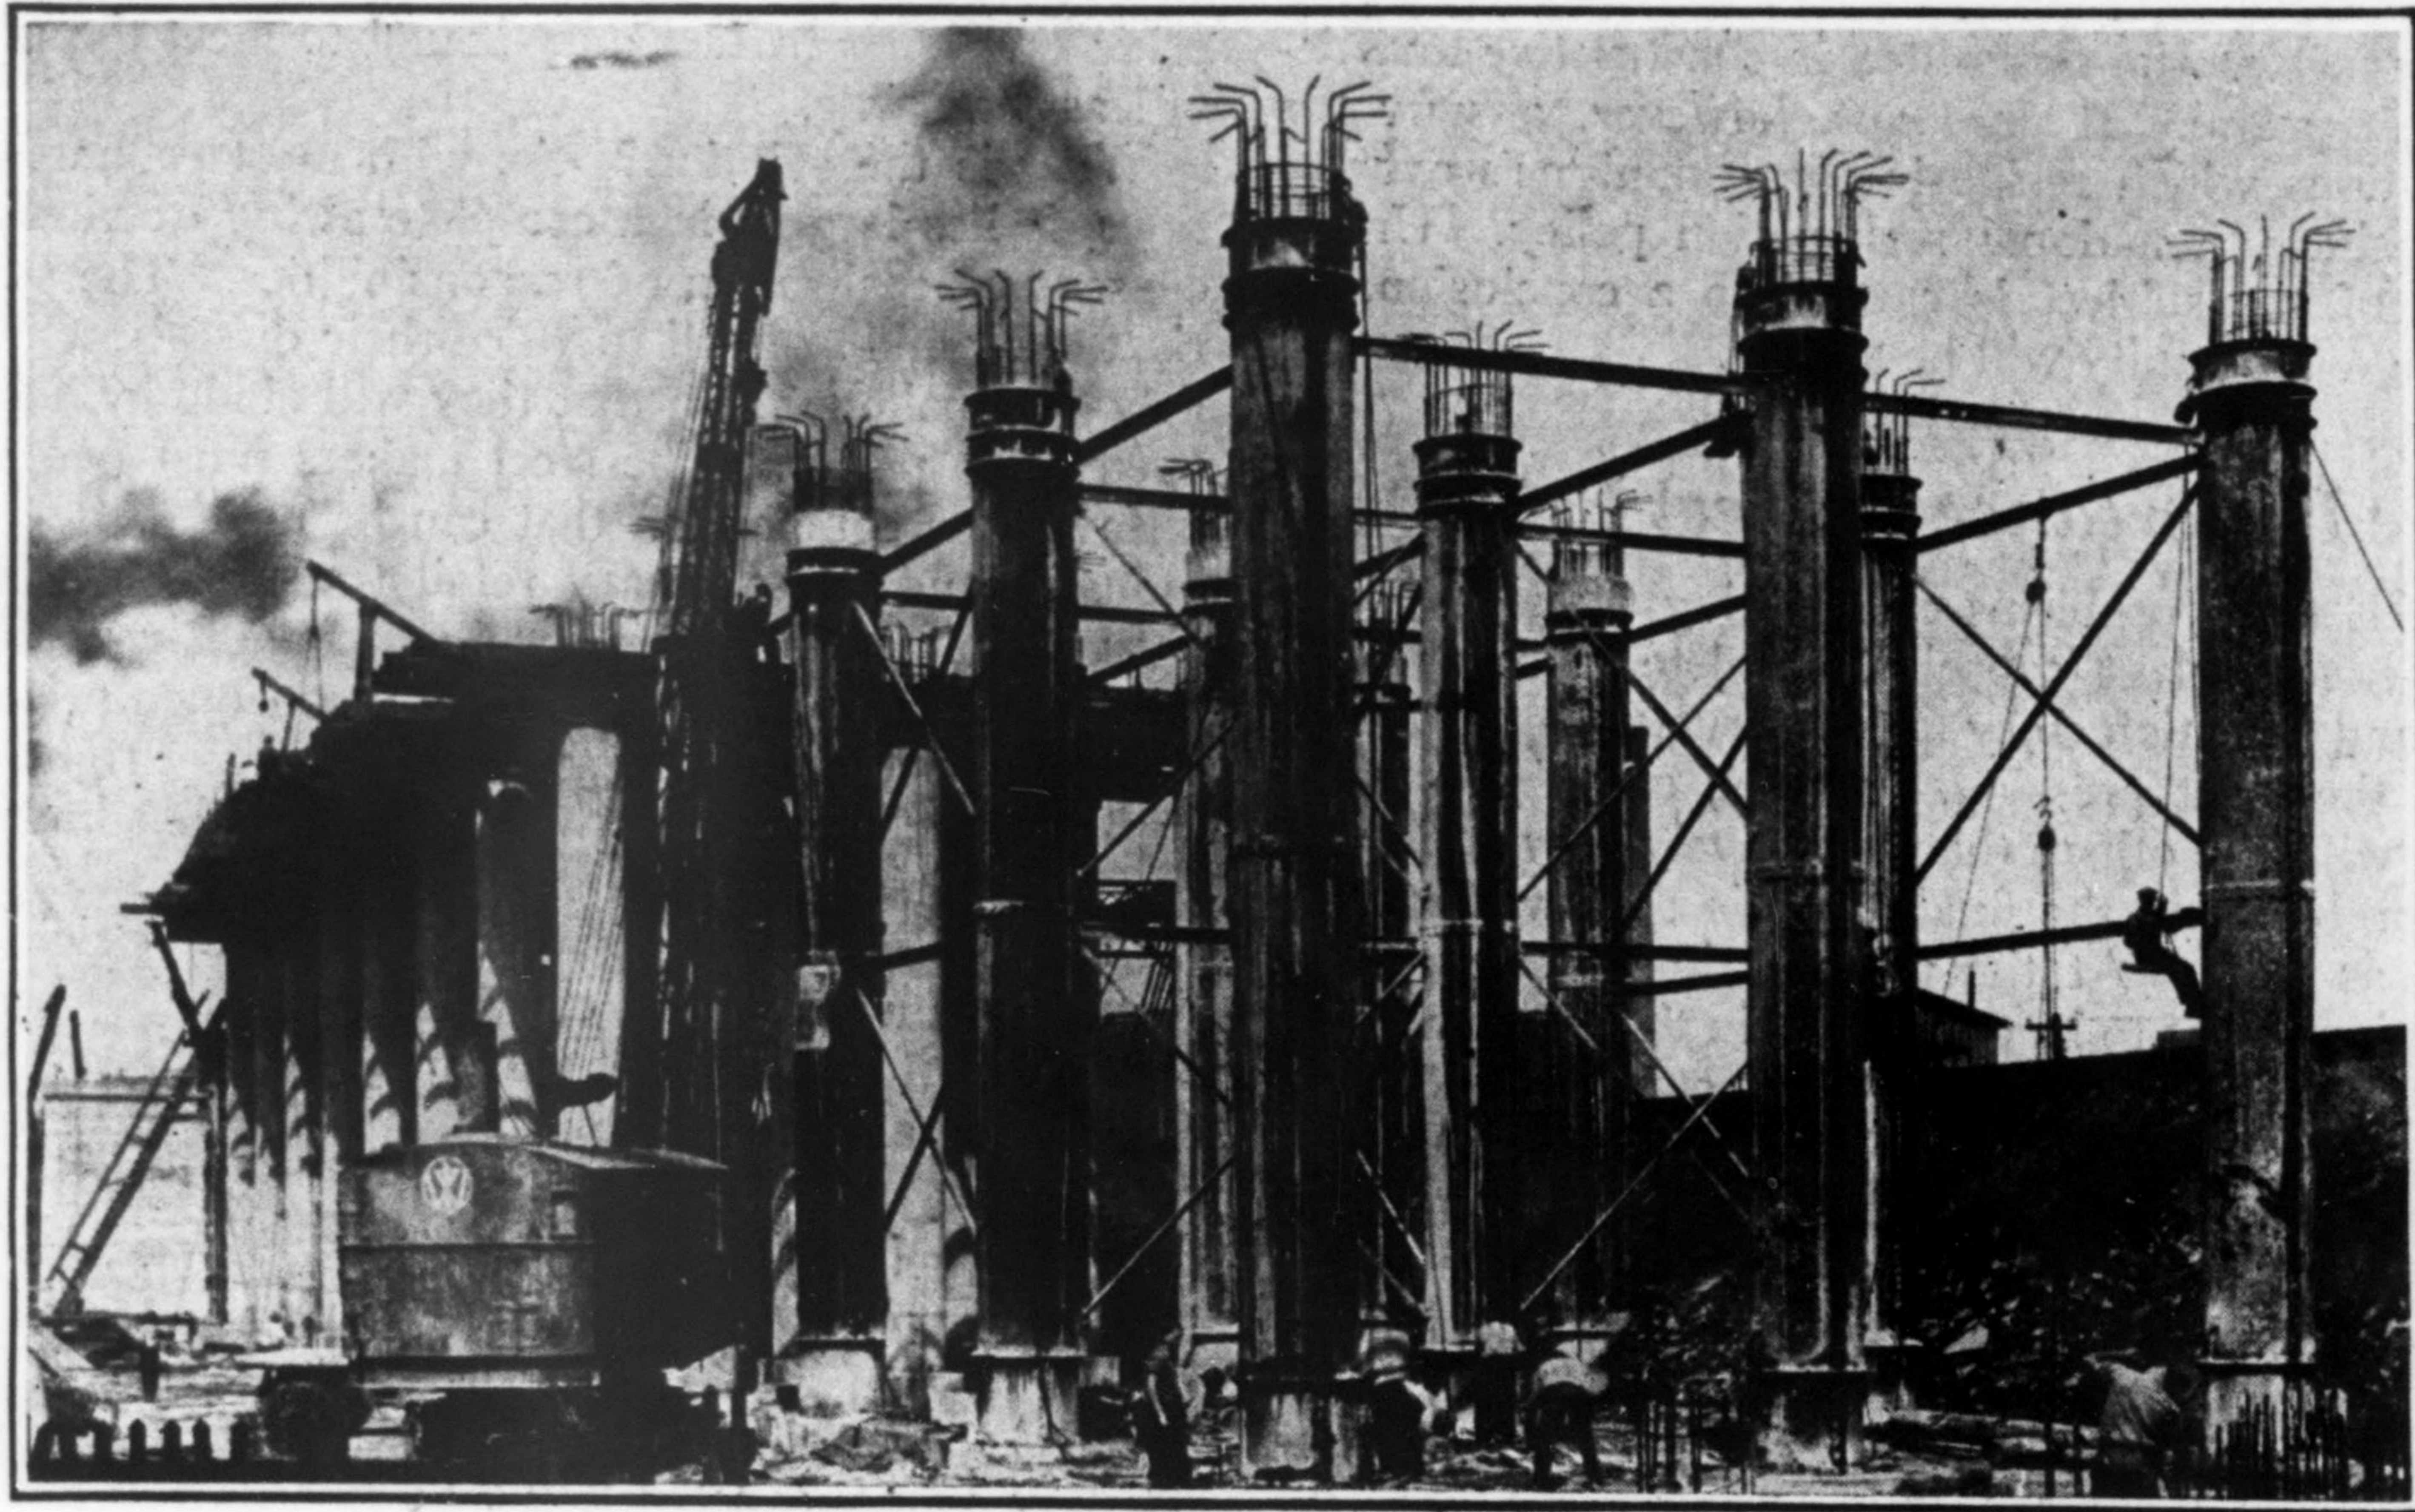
Steel Column Forms and Structural Steel Beams for Slab Forms, Hackensack River Bridge, D.L.&W. R.R.
